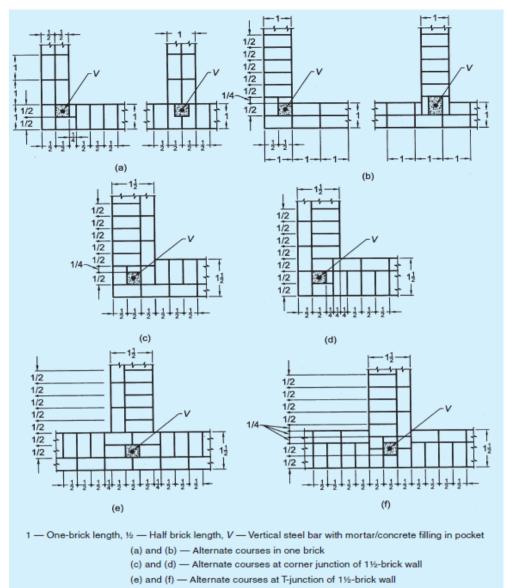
TYPICAL DETAILS OF PROVIDING VERTICAL STEEL BARS IN BRICK MASONRY
